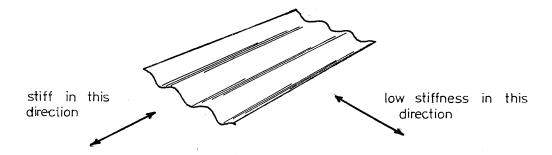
Orthotropy in Corrugated Steel Roofing
